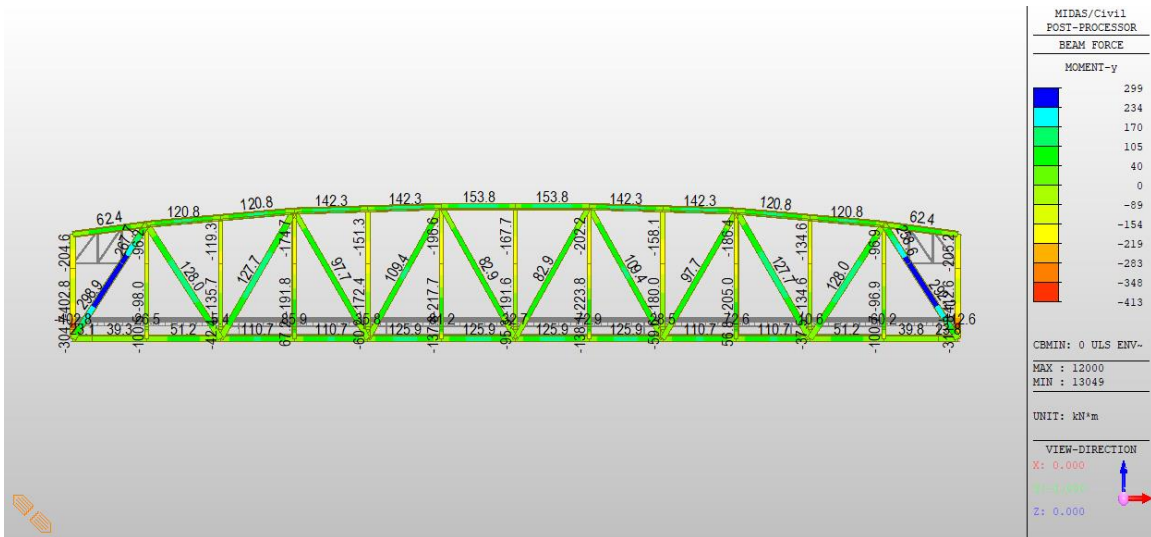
Railway Truss – Case 0 (Existing) Envelope M<sub>y</sub> Min (kN/m)
